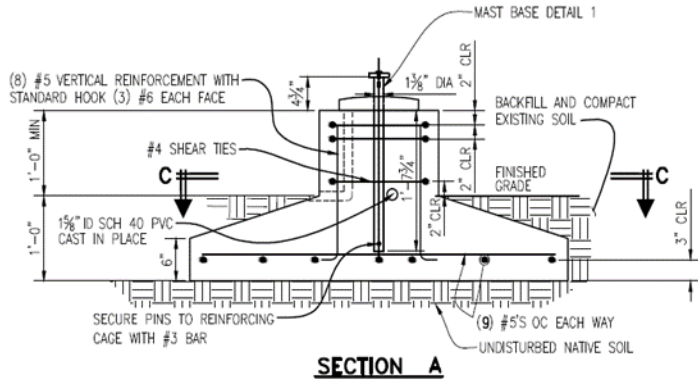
Aluminum Tower Concrete Foundation Single Mast Short (026-82457)
